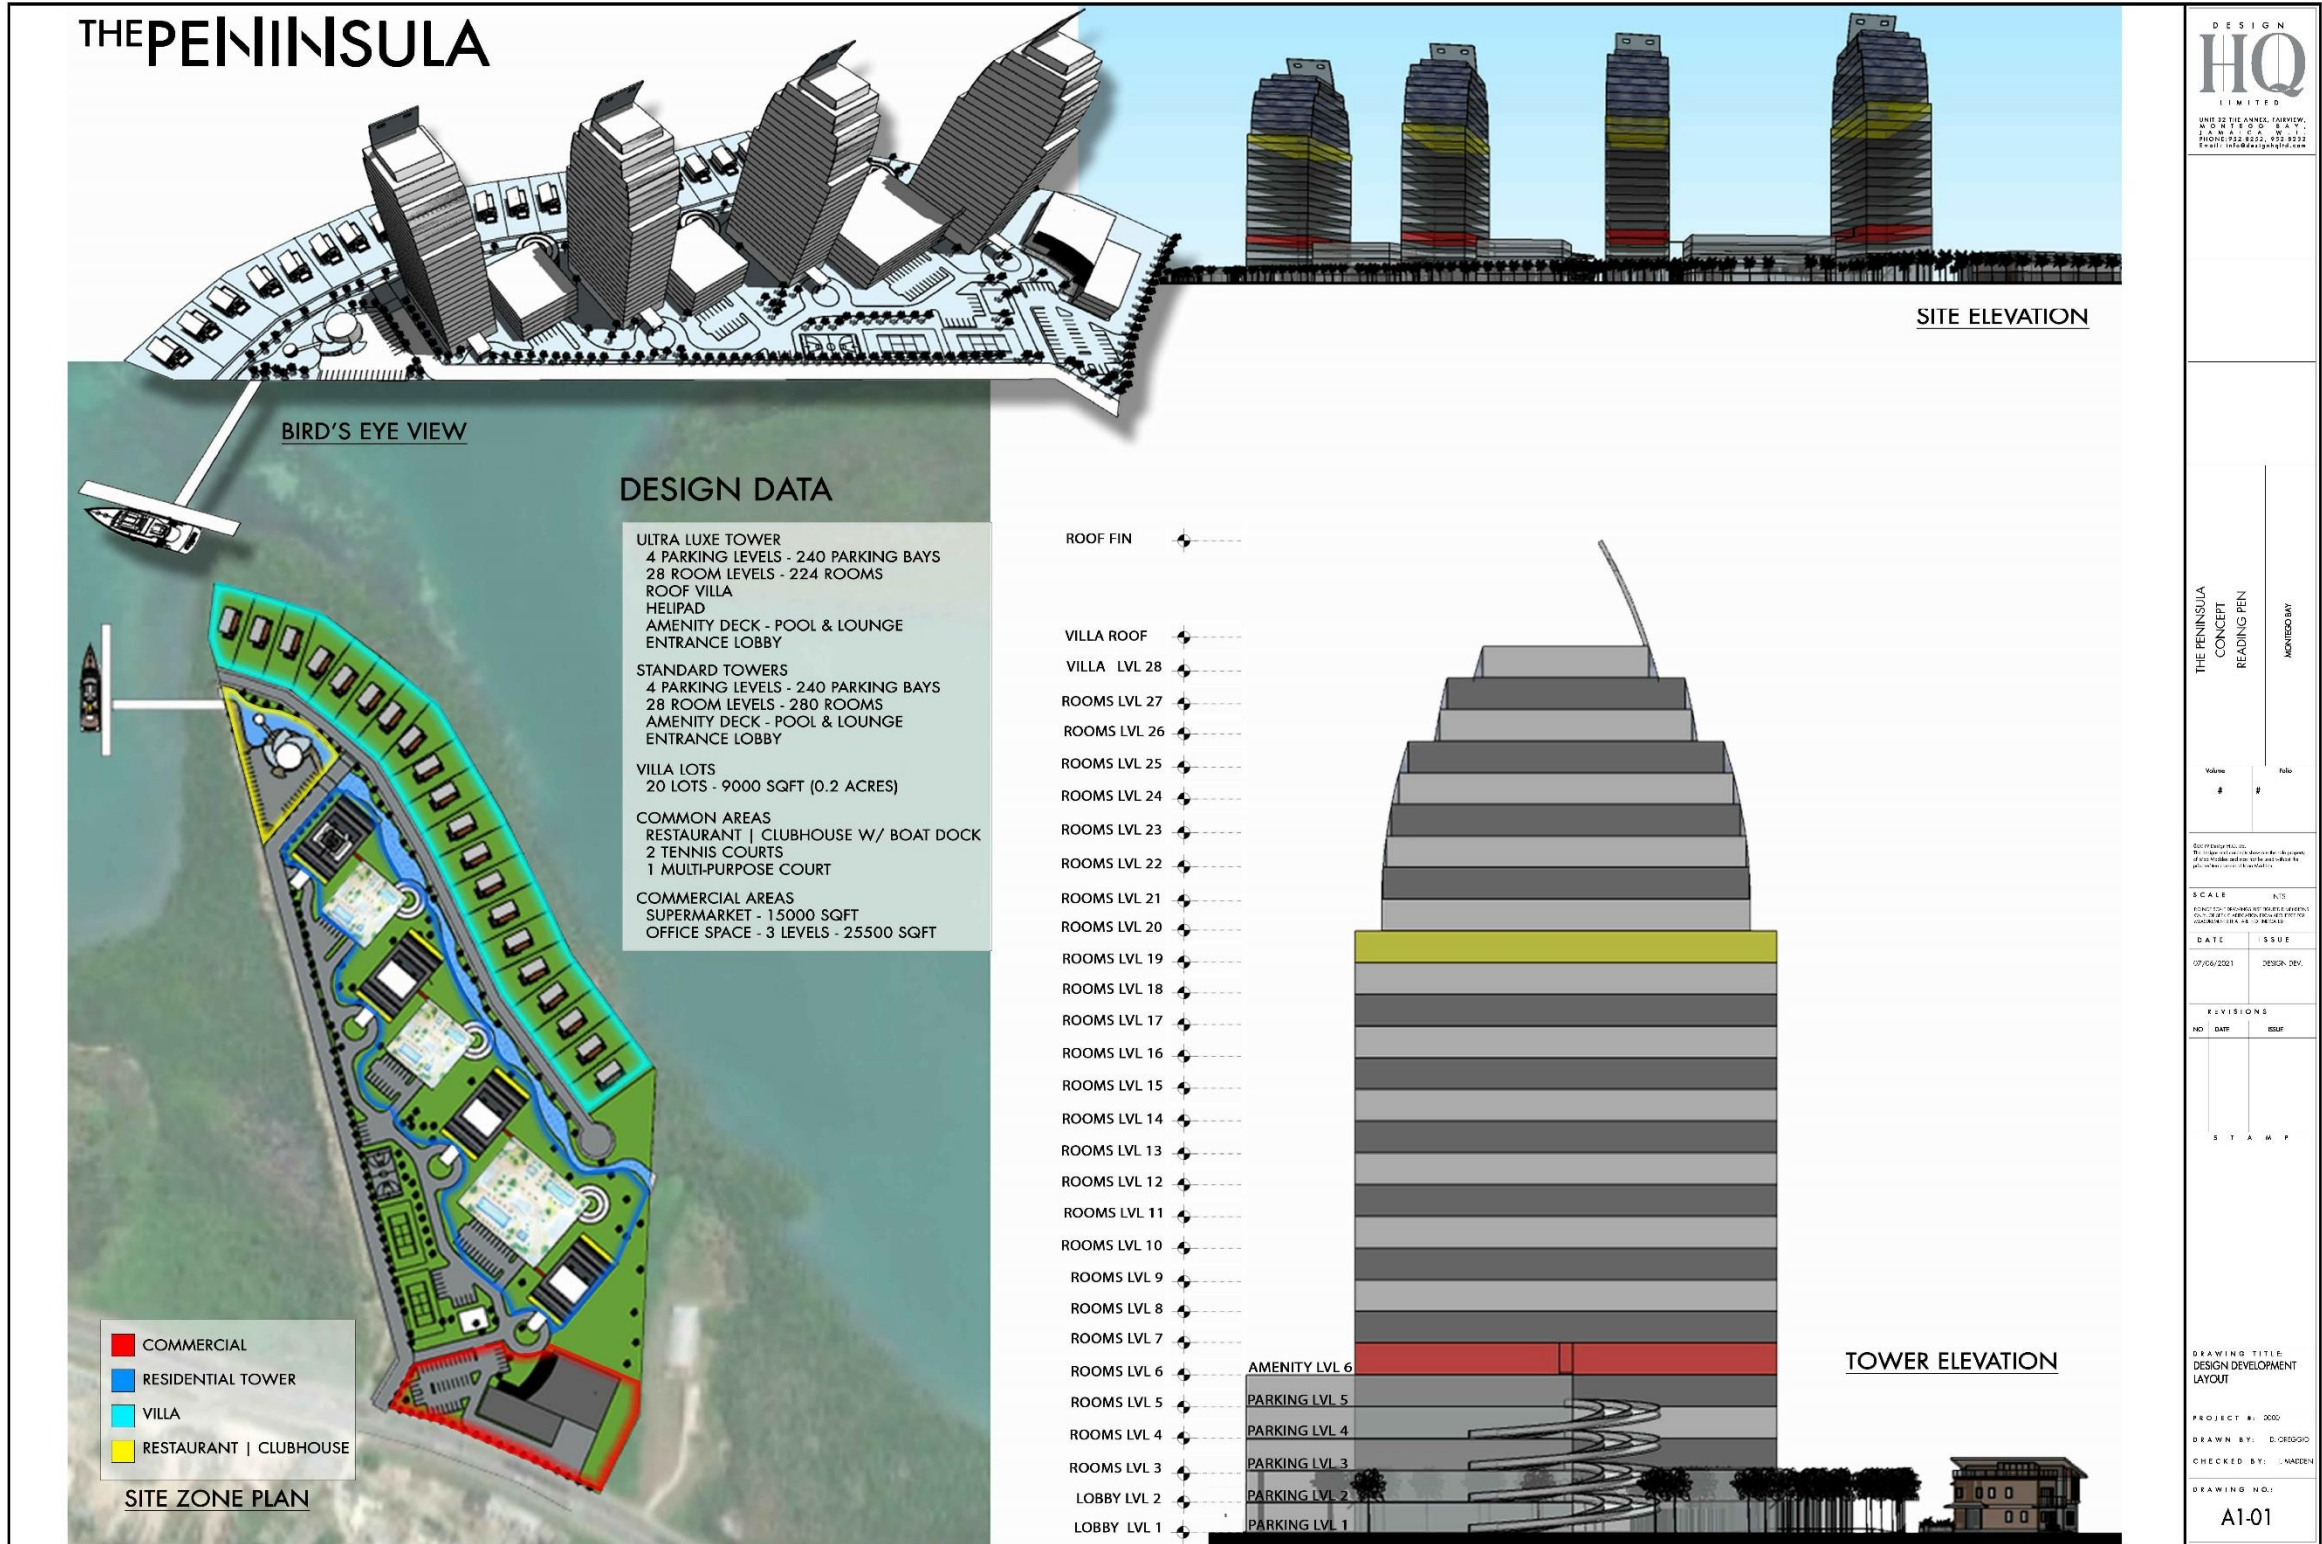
Design data, zone plan, bird's eye view and elevations
